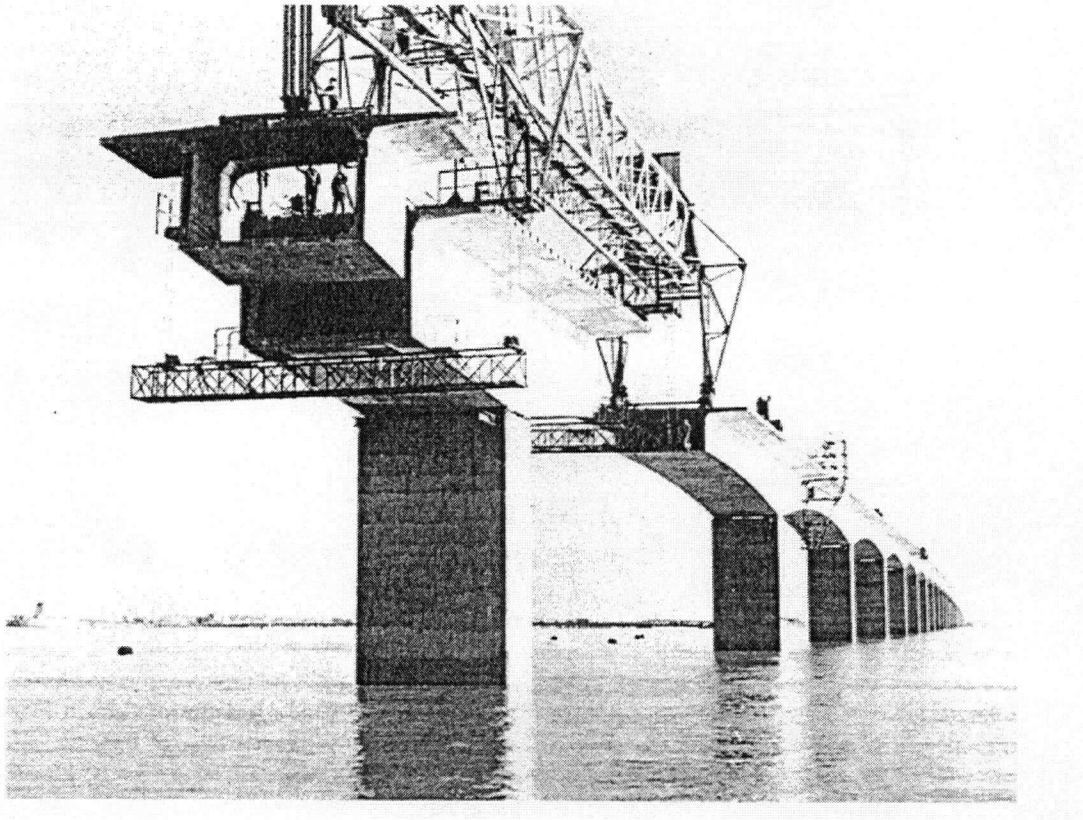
A Precast Segmental Balanced Cantilever Bridge Being Constructed. (Podolny and Muller 1982)
